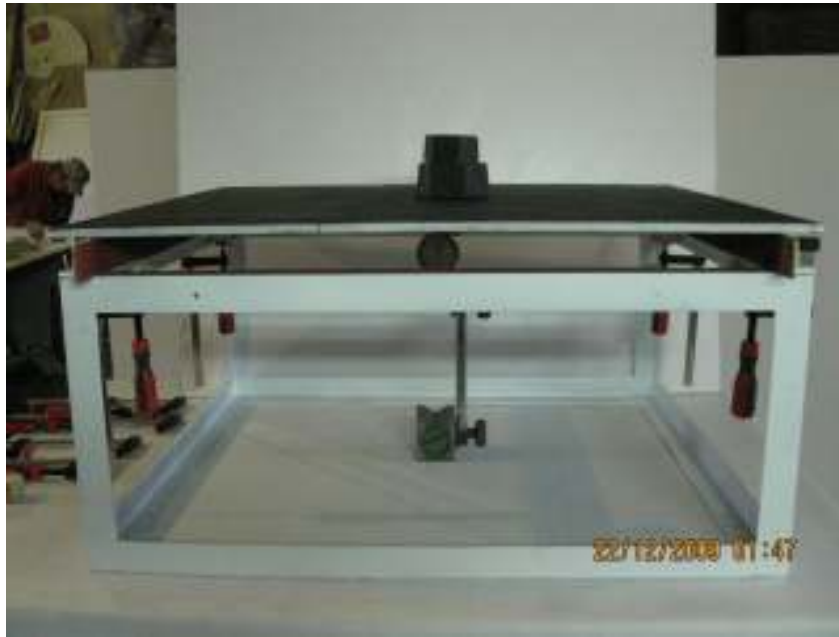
Three-point bend load-unload test detail. Sandwich panel supported linearly on two opposite edges
